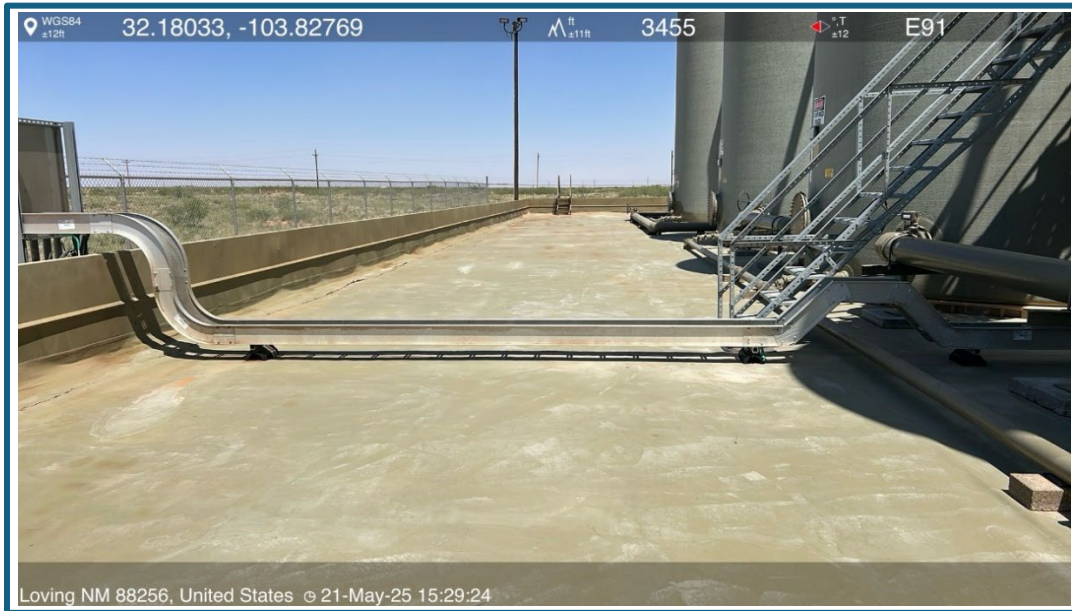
/21/2025	Direction Facing	east	Photo 5
